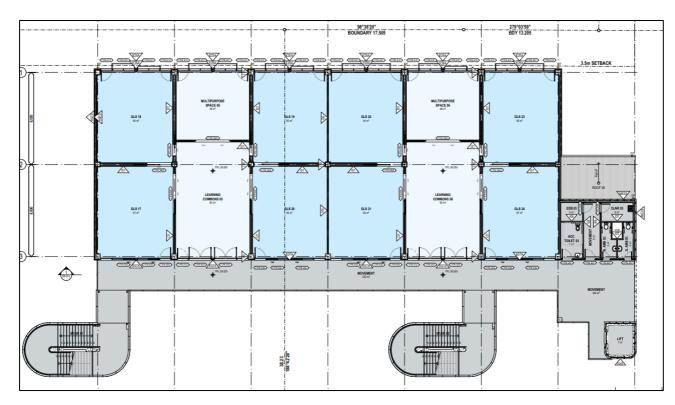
Proposed Level 2 Plan (Fulton Trotter Architects, 2025)
